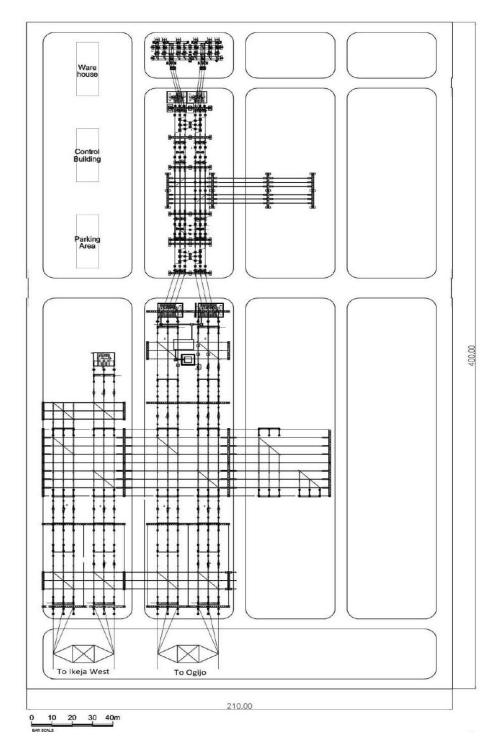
Draft Layout plan of 330/132/33 kV MFM Substation
